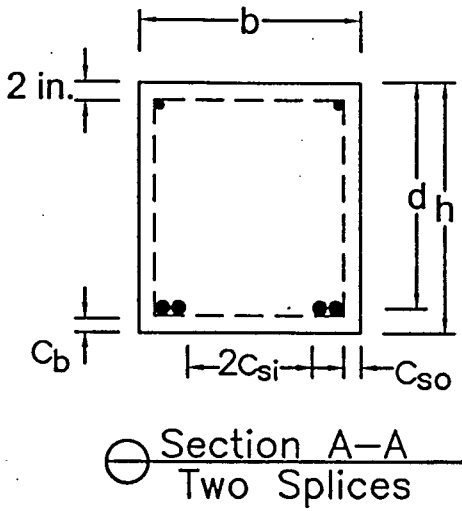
Cross sections of typical splice specimens (Zuo and Darwin 2000)
